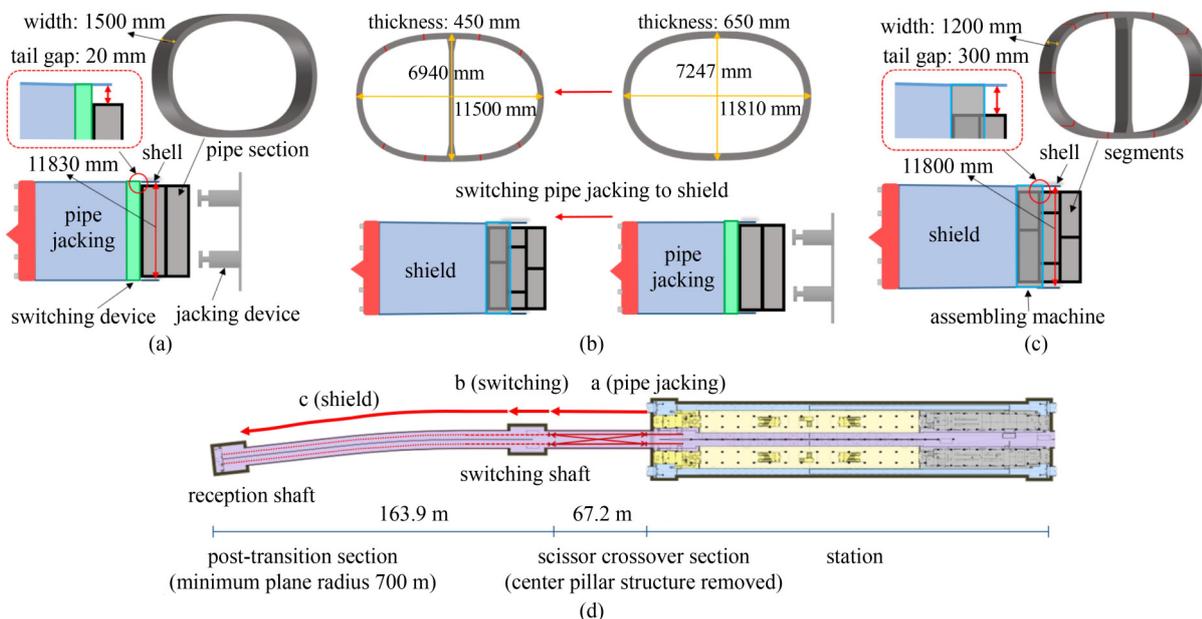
Sijiqing excavation plan and turn-back line interval: (a) quasi-rectangular pipe jacking tunneling; (b) switching pipe jacking to shield; (c) quasi-rectangular shield tunneling; (d) turn-back line interval.
